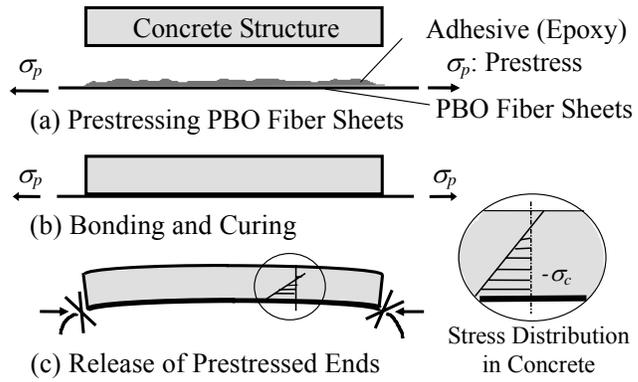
Strengthening of concrete structure with prestressed PBO fiber sheets
